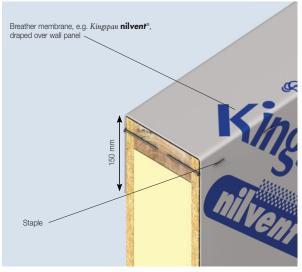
Temporarily Drape Breather Membrane over Wall Panel to Enhance Weather Tightness
